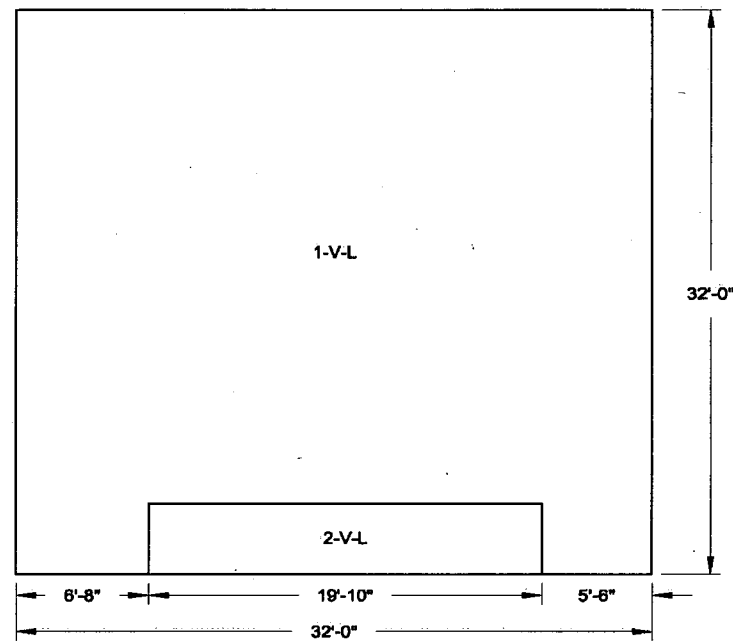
H.8-191: WALL 13 LOOKING FROM OUTSIDE
